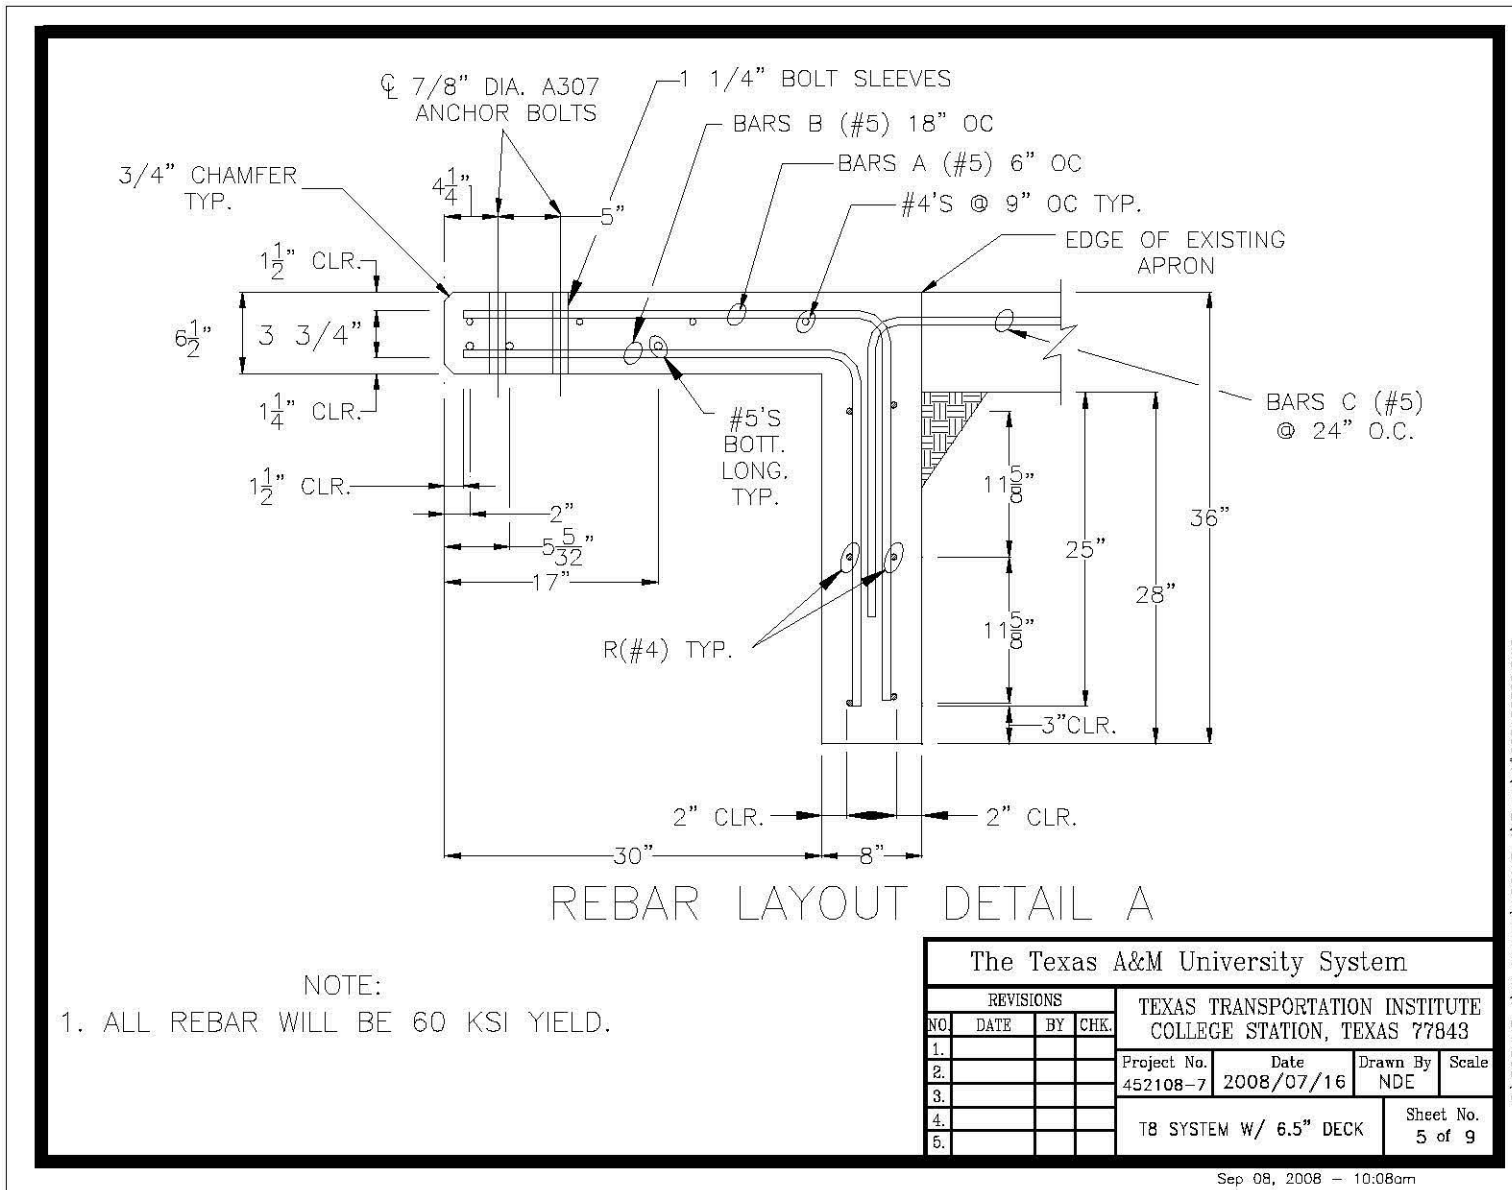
Details of the T8 Bridge Rail Installation – Rebar Layout.
